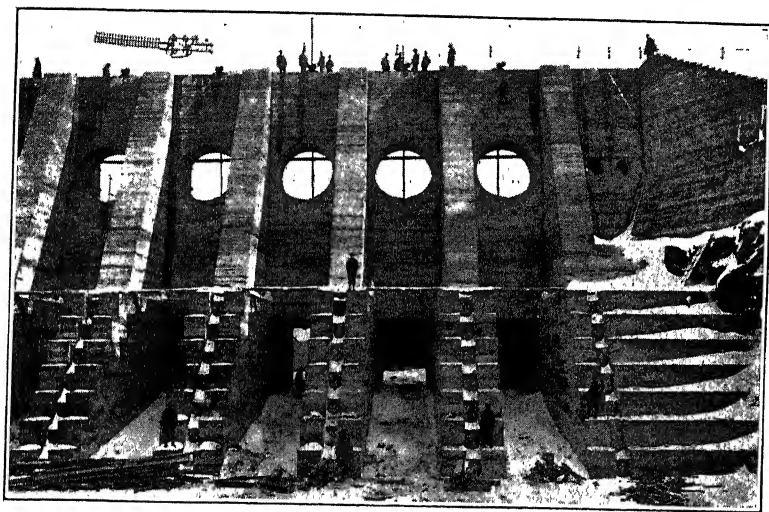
Concrete structure in diversion channel, Minidoka dam.
